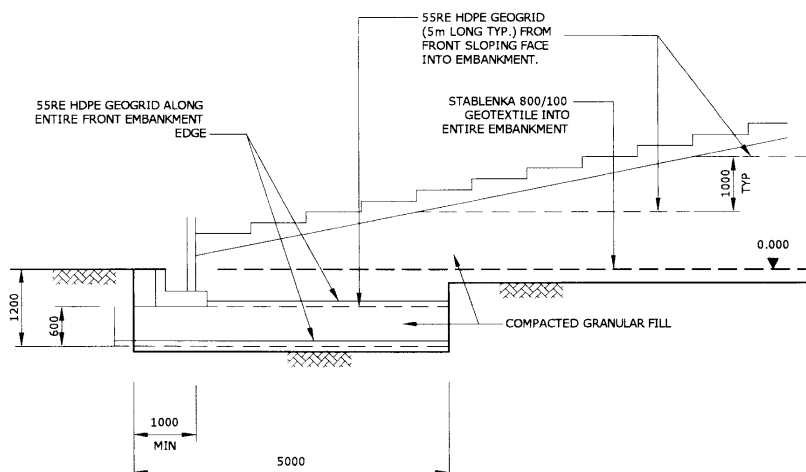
Jade Stadium Geogrid and Geotextile Reinforced Embankment Slope Fronting
